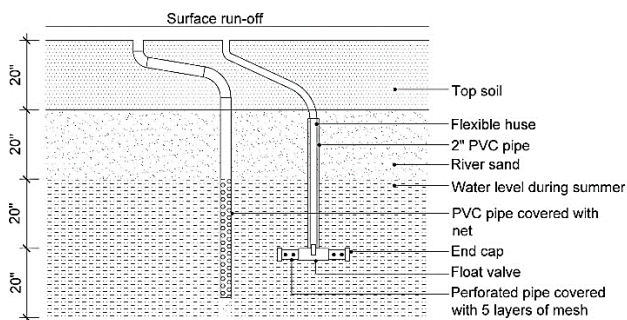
Rainwater harvesting mingled with a pavement design at an interval dependent on the run-off. Image adapted from: Sustainable Building Design Manual, Vol.2 (7)
